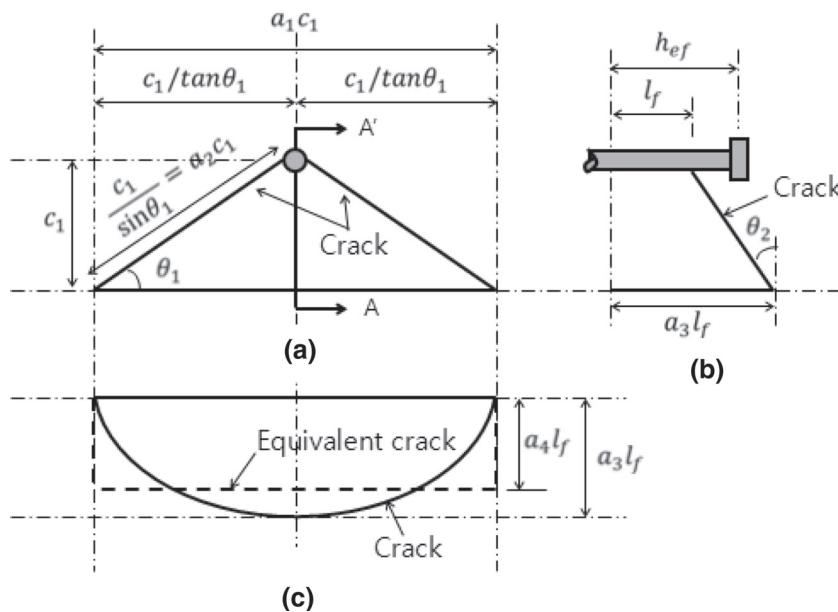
Failure shape for shear anchor. a Plan. b Section A-A'. c Front view.
